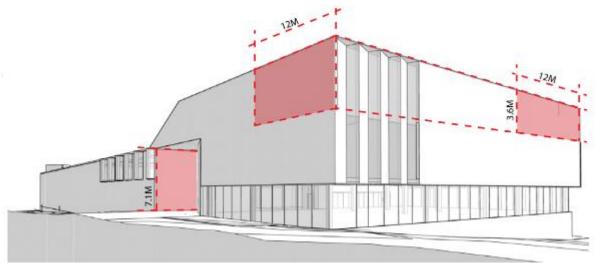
Signage zone locations on west and south elevation including at main western entry, view from Showground Road looking north east Source: Lahznimmo Architects
